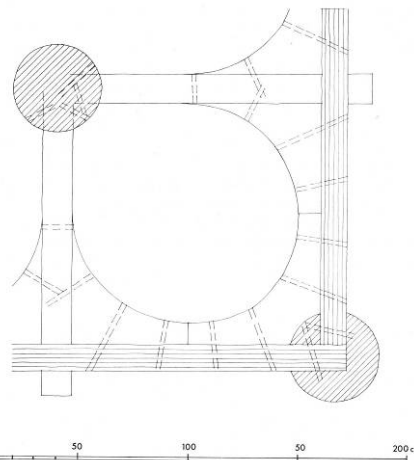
Church in Kaupanger, horizontal projection of wall corners with stiffening by pegs and boards (equivalent to bracing). Source: [1]
